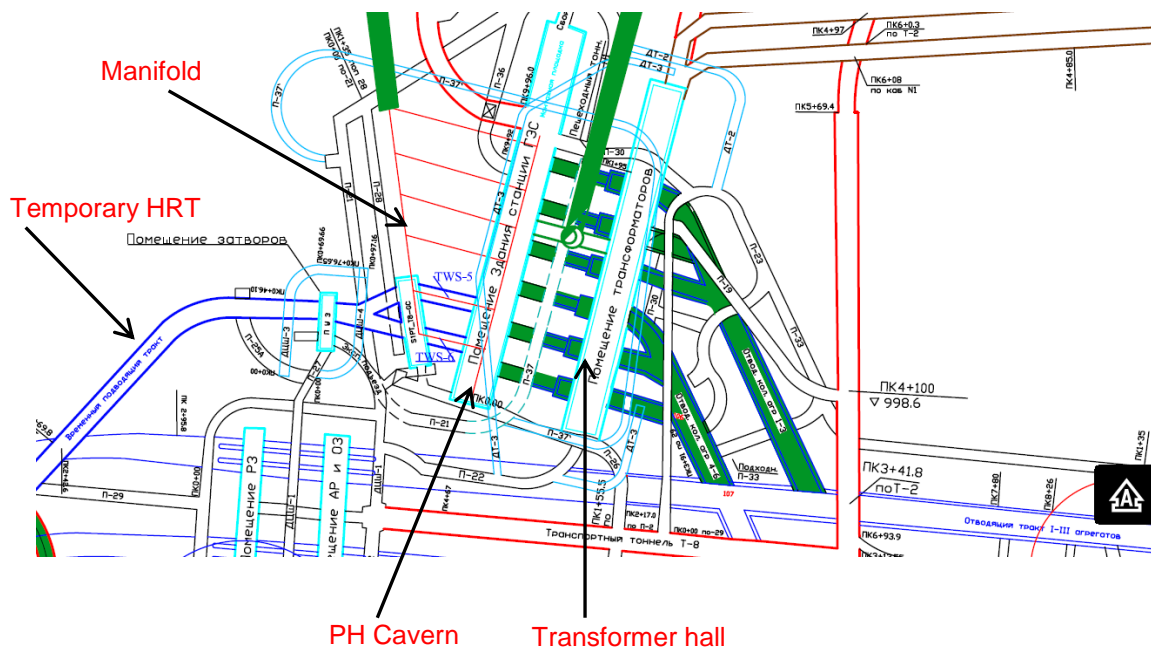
Power house, extracted from the drawings Underground complex 2, HPI 2009
